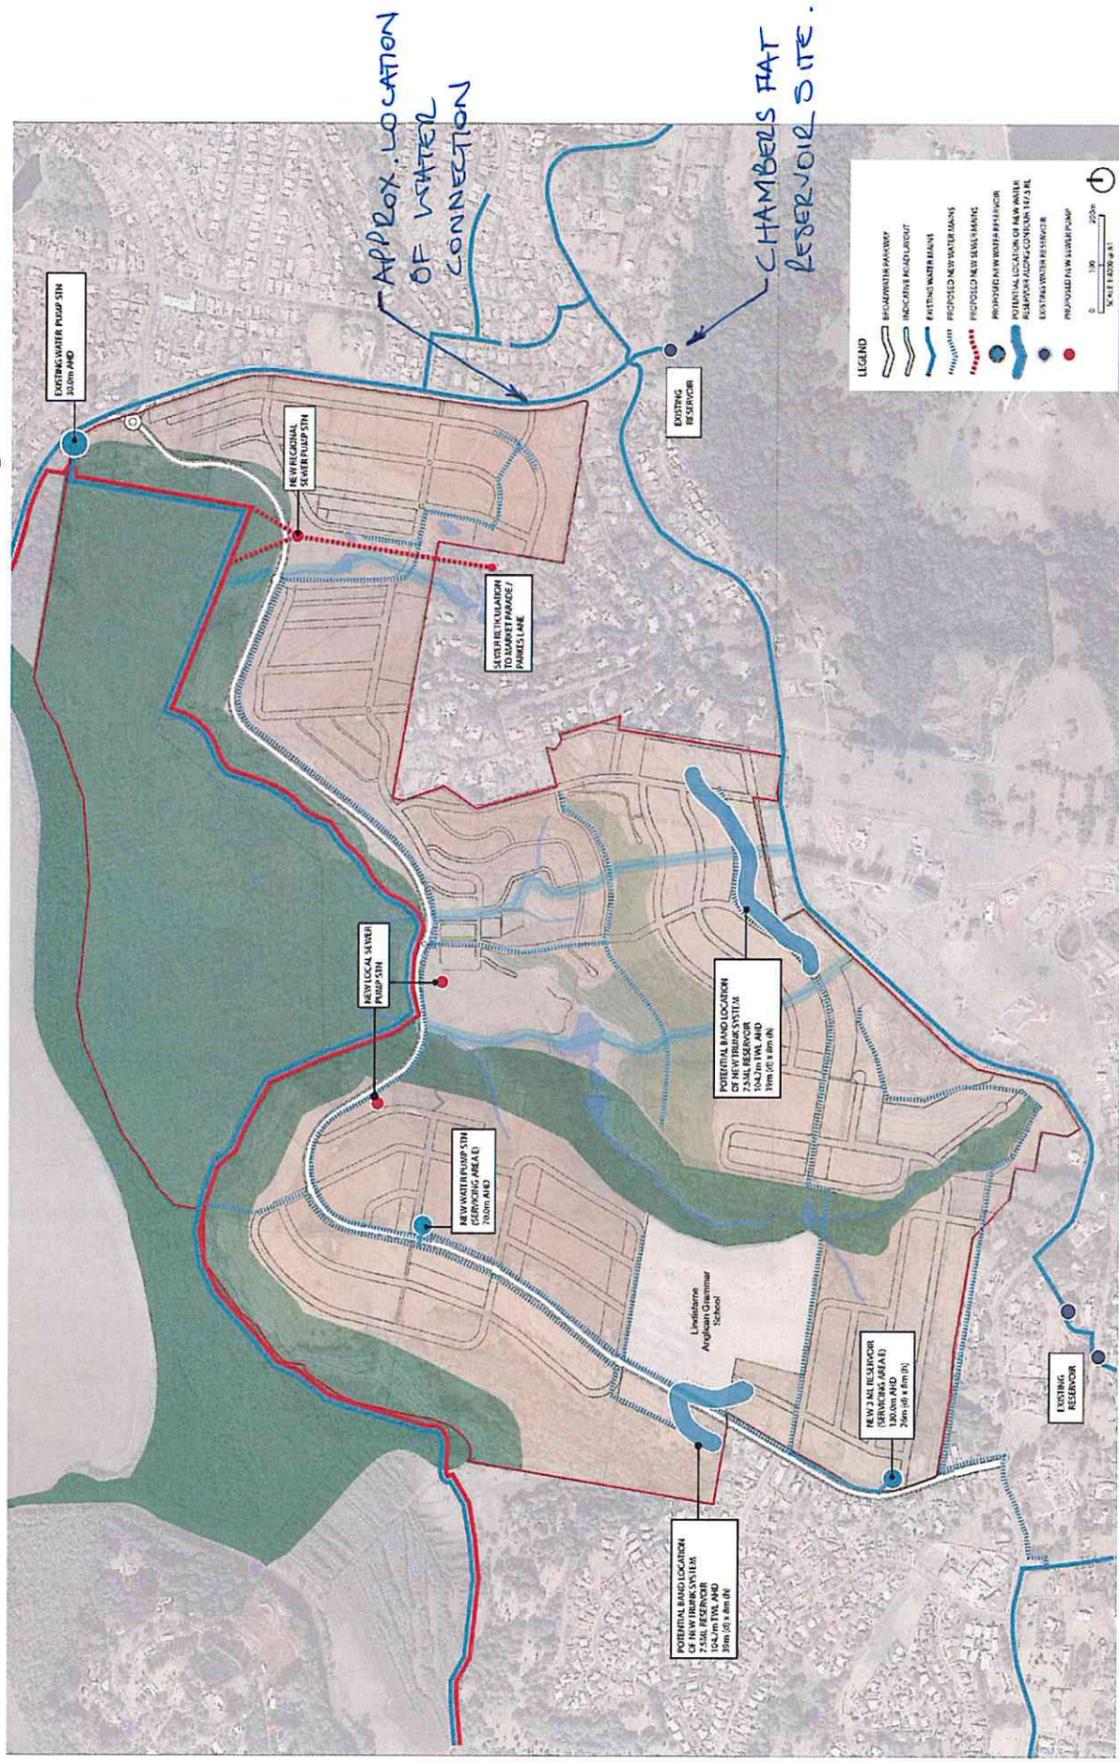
Area E Conceptual Water and Sewer Reticulation Strategy
